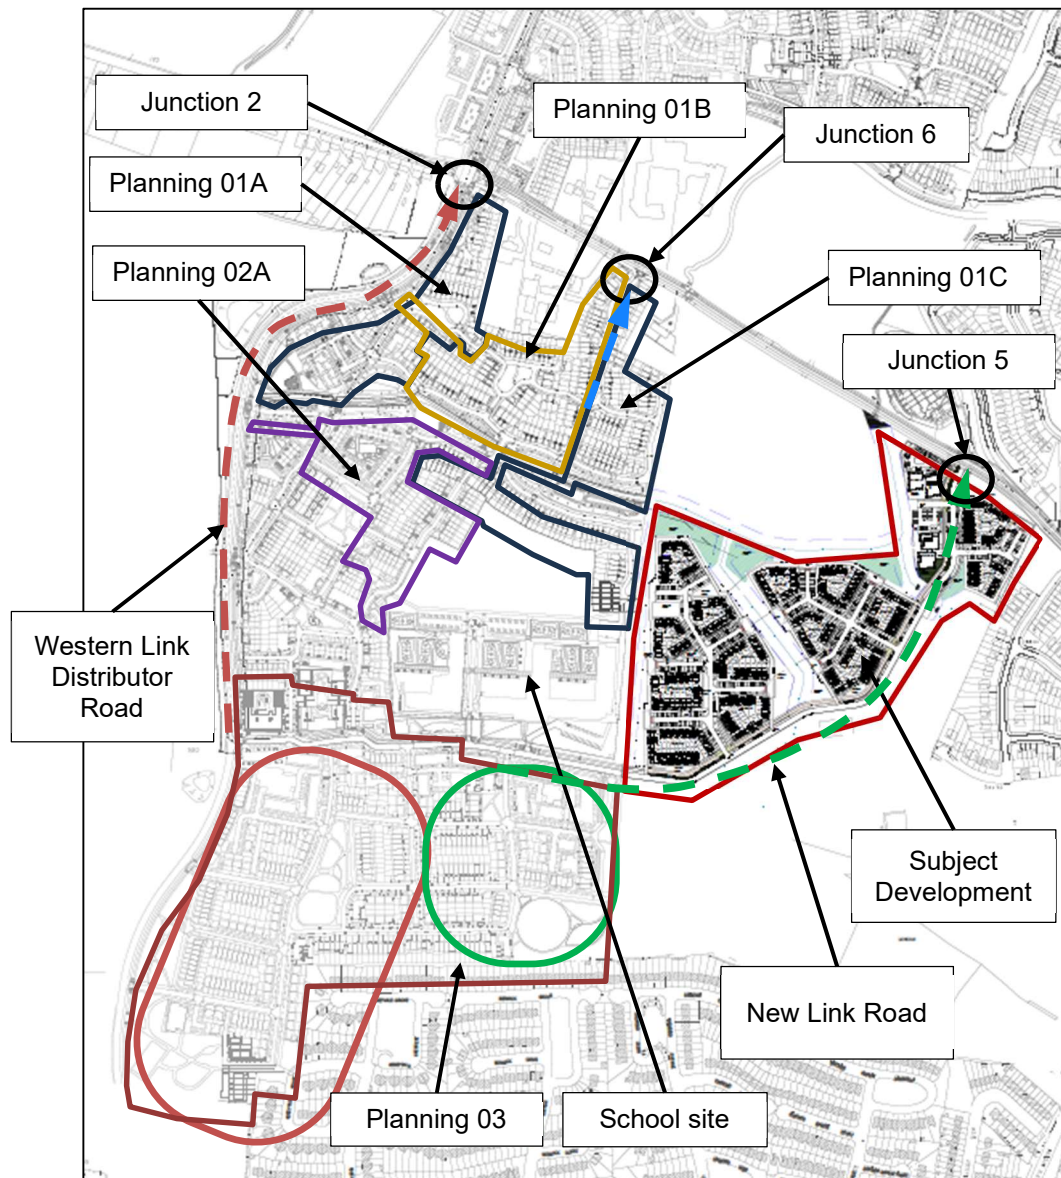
| Mooretown – Vehicular movement of each Planning & the Subject Development.
